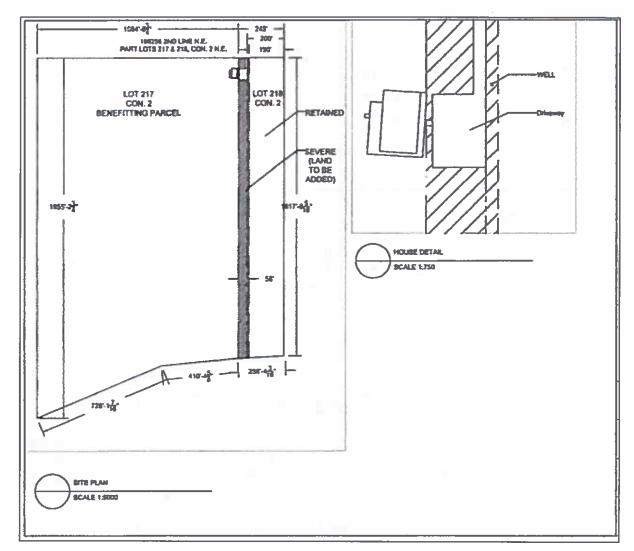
Subject Lands and Proposed Boundary Adjustment
